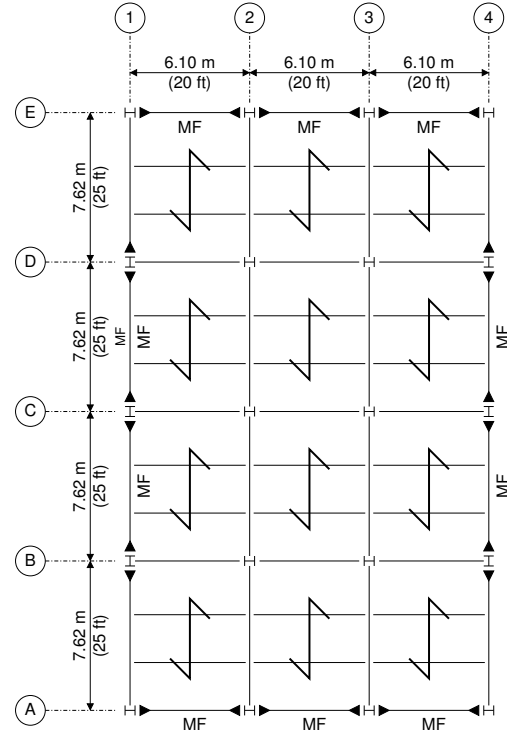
Typical floor plan of the building under study. Moment-resisting beam-to-column connections are indicated by solid black triangles.
